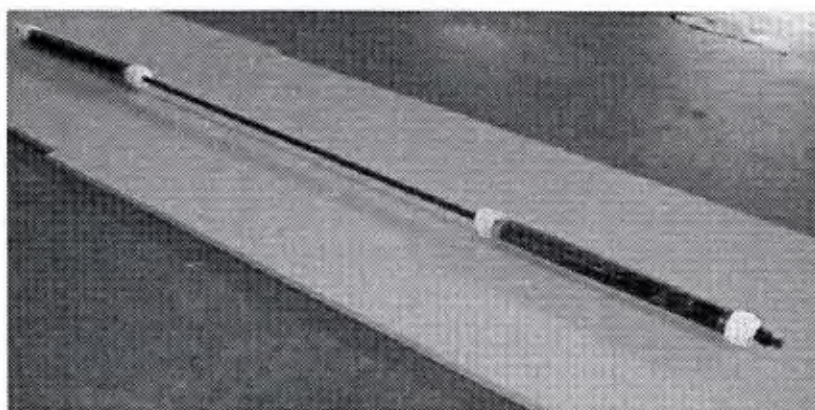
Pultruded carbon rod coupon test specimen anchored in steel pipe.
